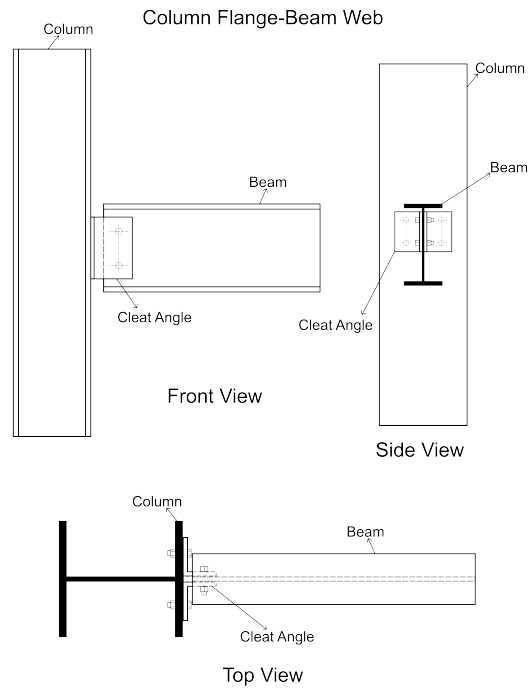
Cleat angle Connection – Column Flange-Beam Web
